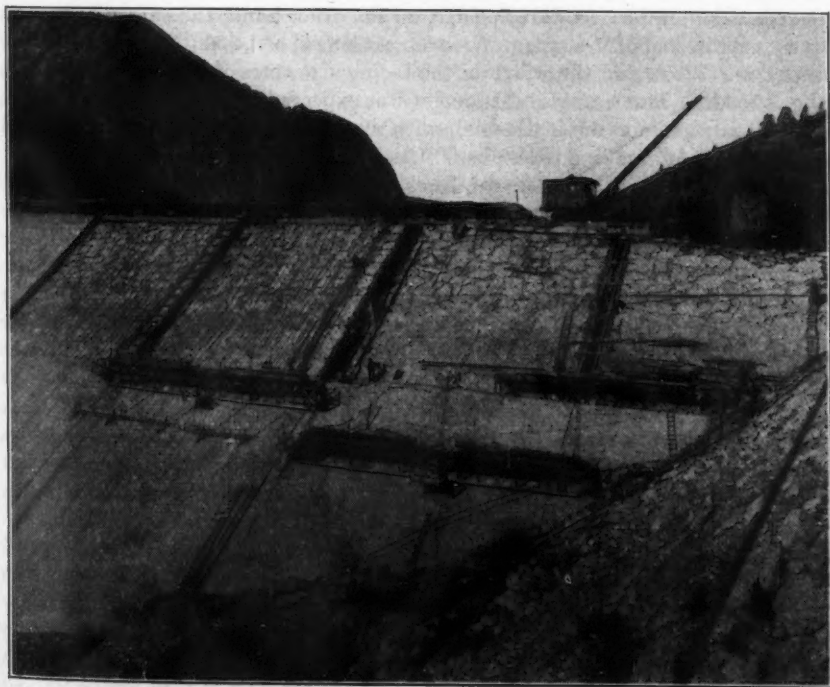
CONSTRUCTION OF CONCRETE FACING, SALT SPRINGS DAM
